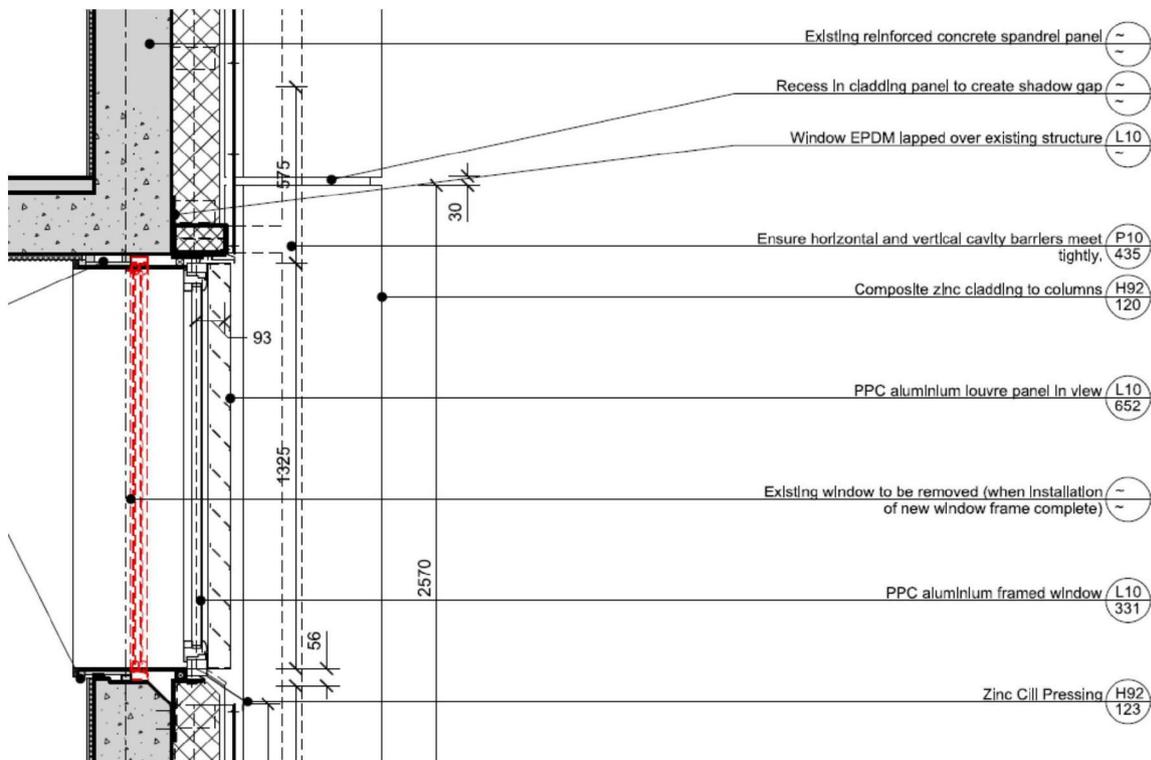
Extract of ‘Proposed Section – Typical Bay’ from drawing 1279 (06) 110 00 ‘Proposed Typical Bay, Plans, Section & Elevation’ {SEA00002499}
